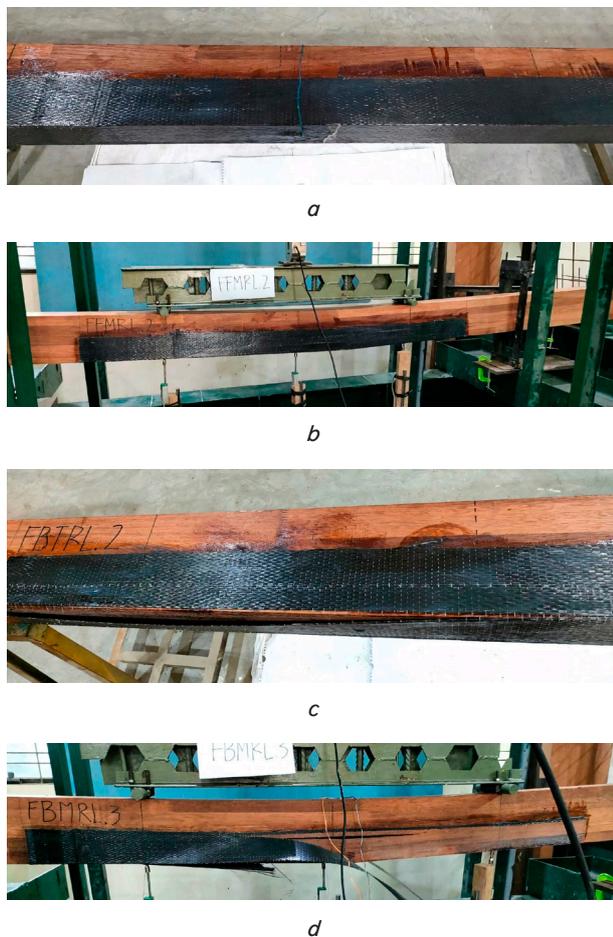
Damage to laminated wood beams with finger joints reinforced with CFRP: *a* – Three-lamina face finger with CFRP reinforcement; *b* – Five-lamina face finger with CFRP reinforcement; *c* – Three-lamina face butt with CFRP reinforcement; *d* – Five-lamina face butt with CFRP reinforcement
